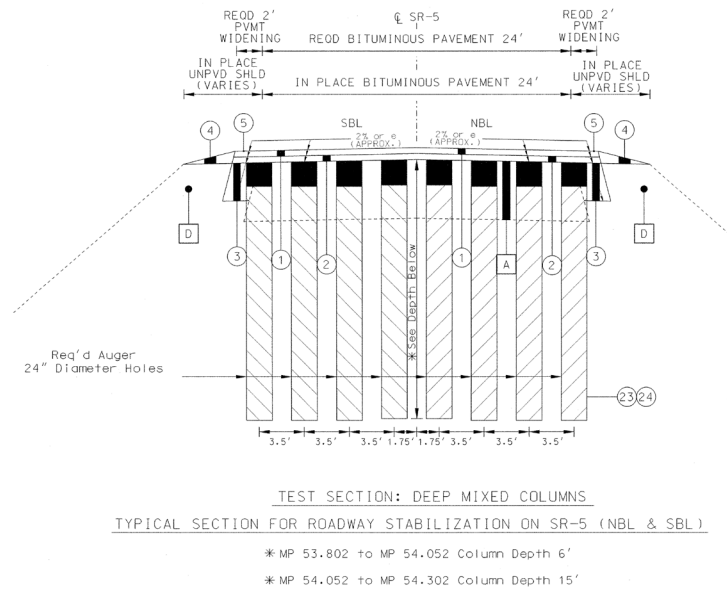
Deep Mix Columns Cross-Section (ALDOT 2015)
